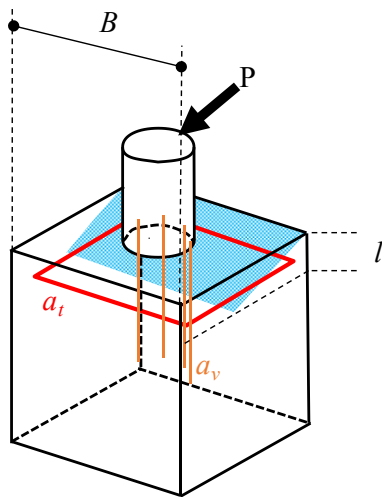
Schematic of reinforcement resisting the tensile failure.
